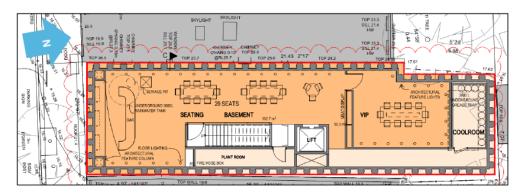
Proposed Basement Floor Plan (Image Source: YBL Remmus Architecture)
